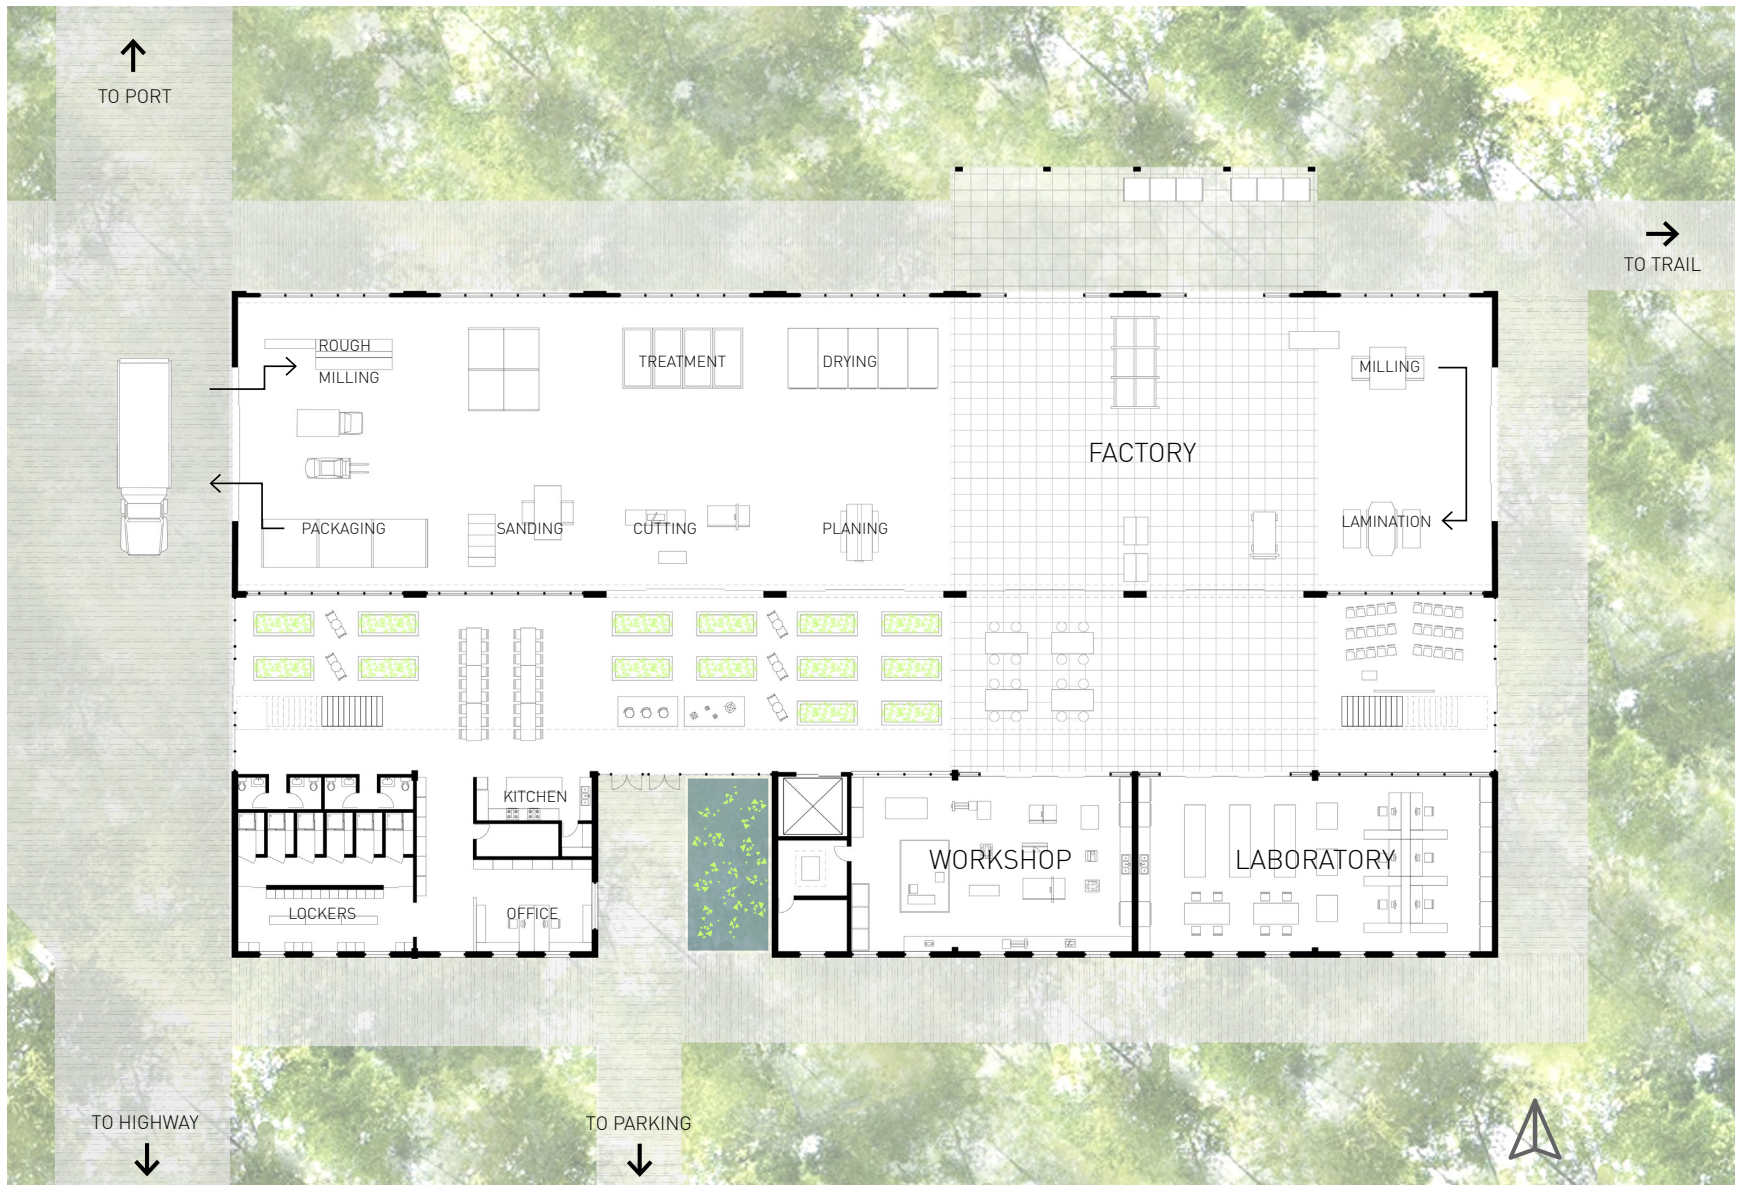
First floor plan, 1/32" = 1' - 0"
